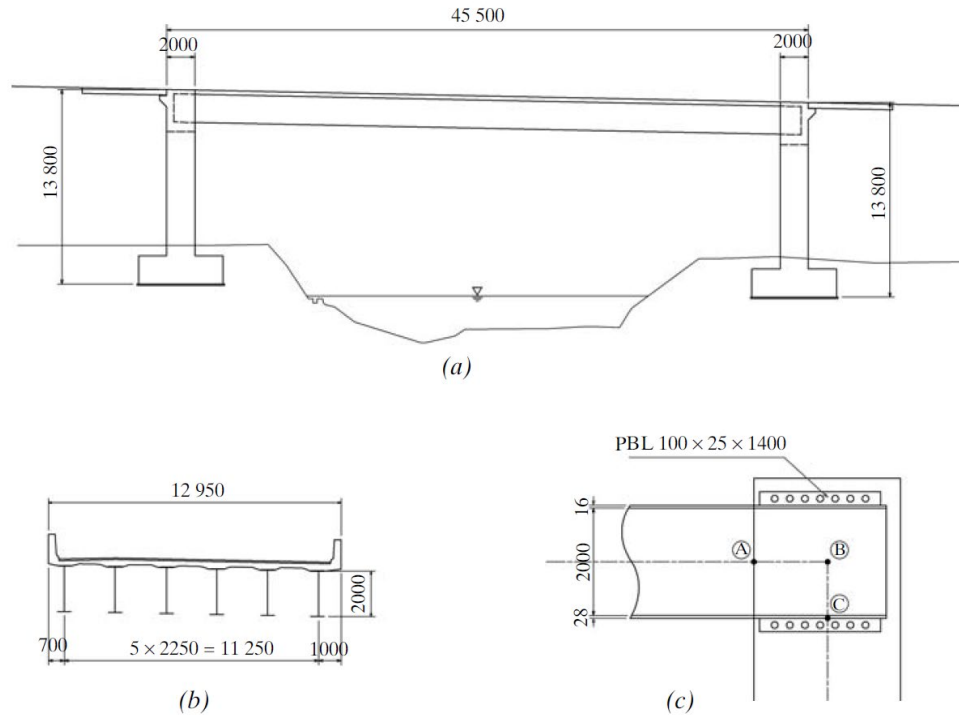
Example of a portal frame bridge: (a) profile view; (b) superstructure cross section; and (c) steel girder end detail (Iwasaki et al. 2011)
